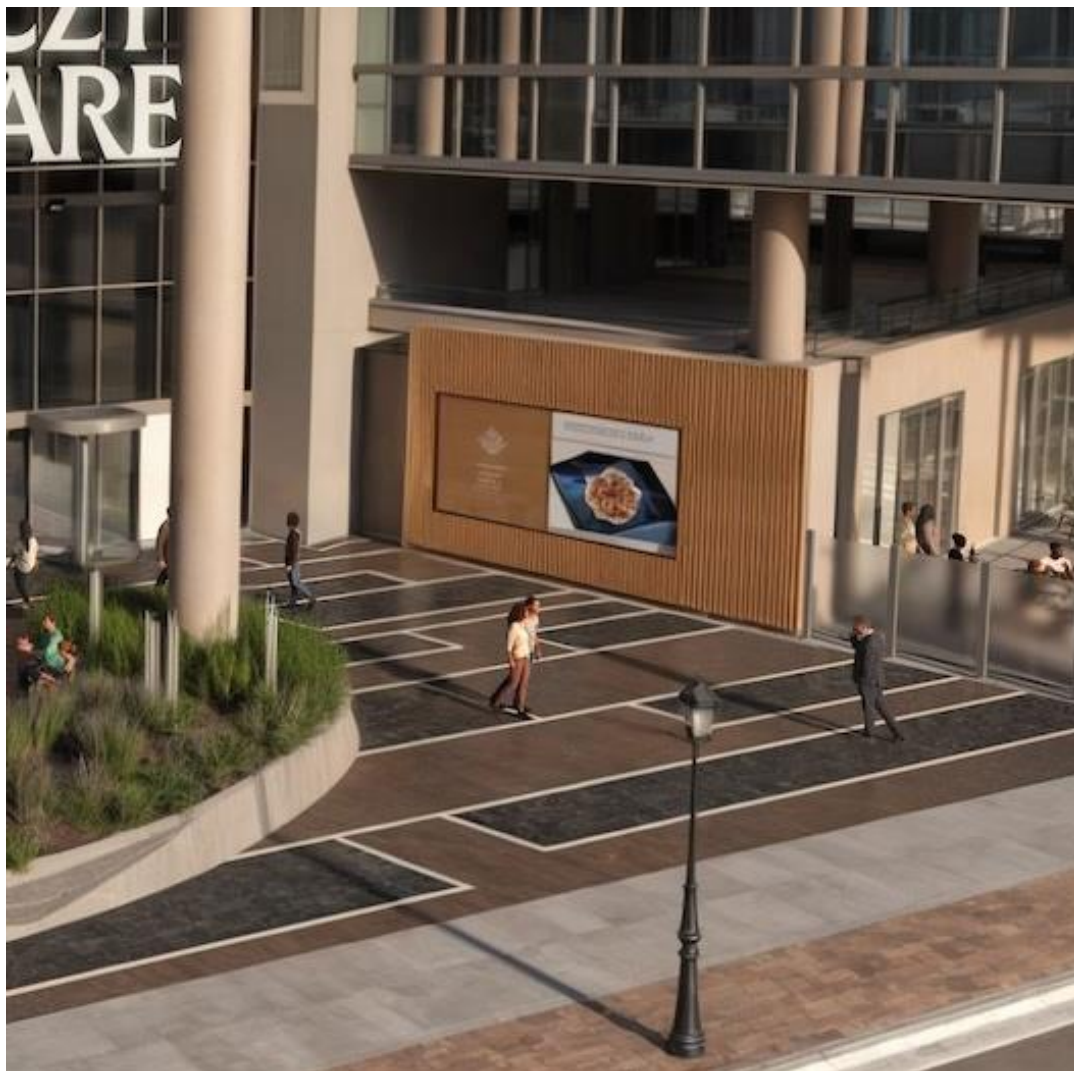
Proposed Wall Sign: Digital First-Party
